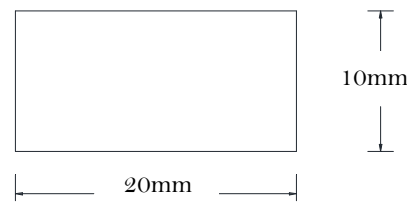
Cross section dimensions of an unreinforced wood beam
